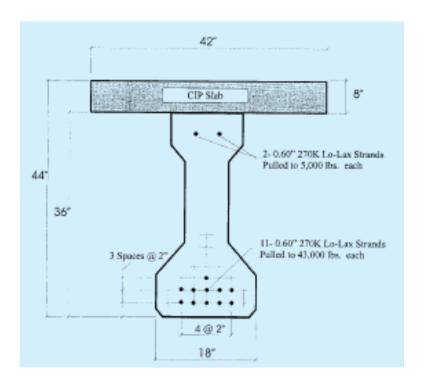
Section Details of Type C Test Girders (M. Shahawy 2001)
